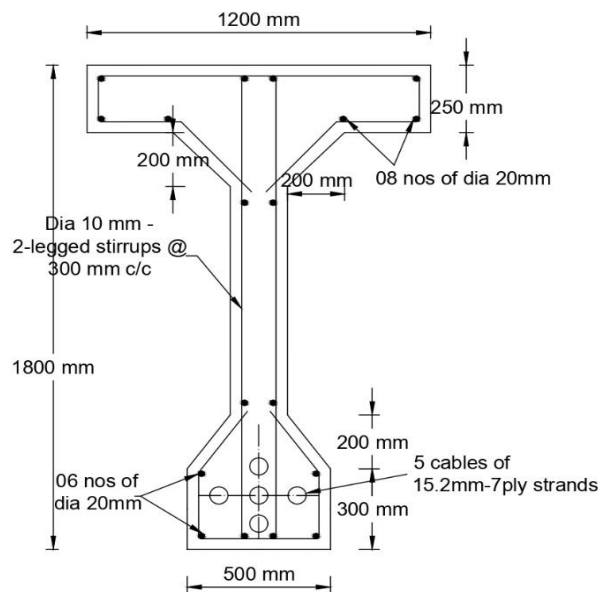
Reinforcement Details of Prestressed Girder at Center of Span Section
